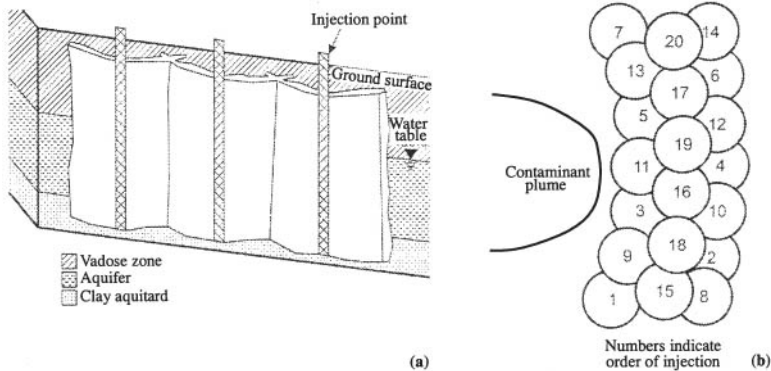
(a) Diagram of a vertical thin diaphragm wall and (b) plan view of a grouted impermeable barrier installed using jetting technique (adapted from US Army Corps of Engineers 1997, <<http://www.usace.army.mil/inet/usace-docs/design-guides/dgl110-345-117/entire.pdf>>)
